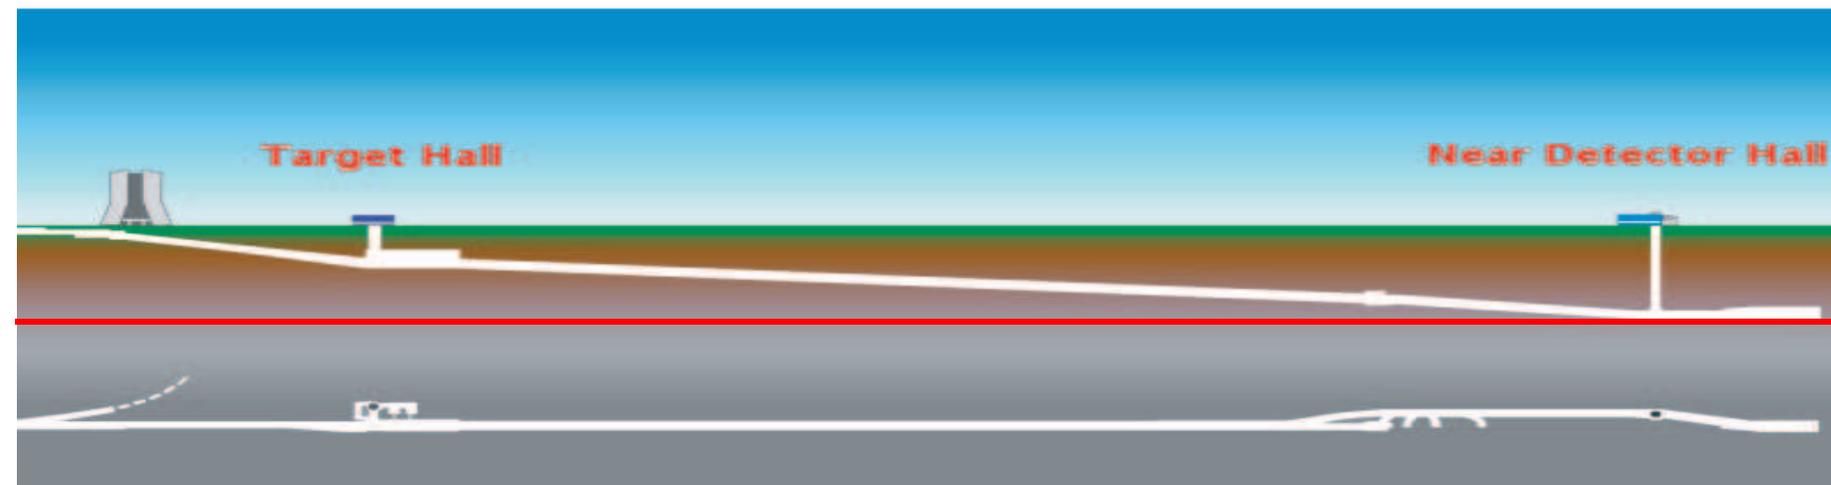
Plan (bottom) and elevation (top) views of the NuMI beam line.
